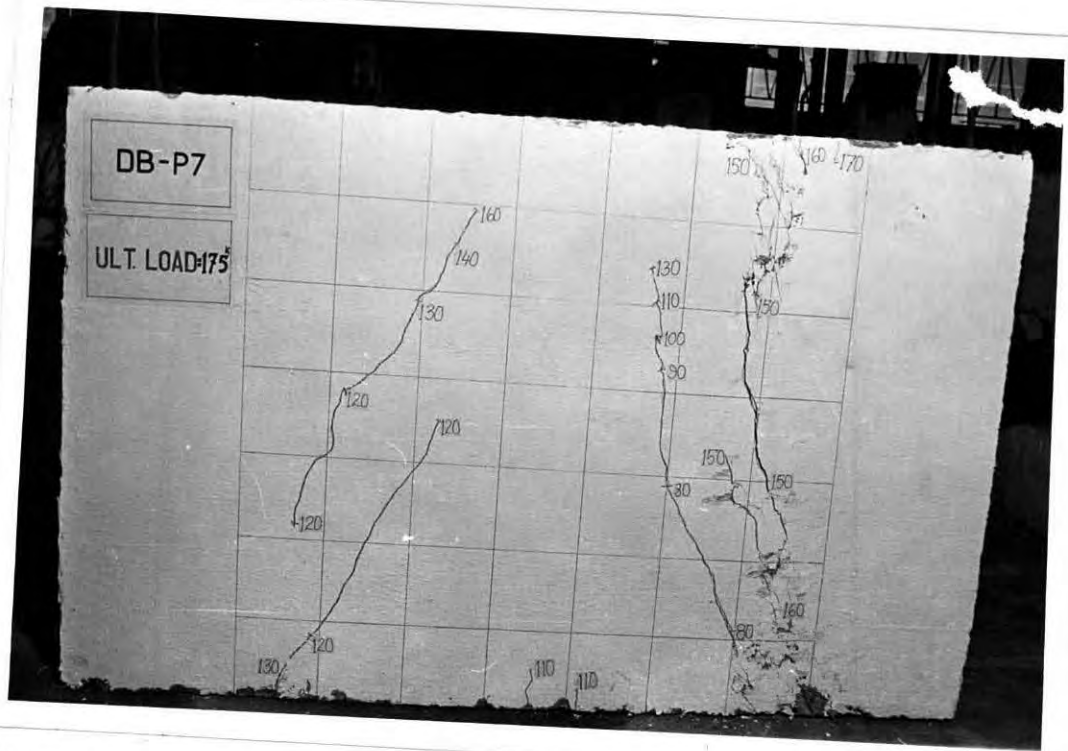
Mode of Failure and Crack Pattern of Beam DB-P7
